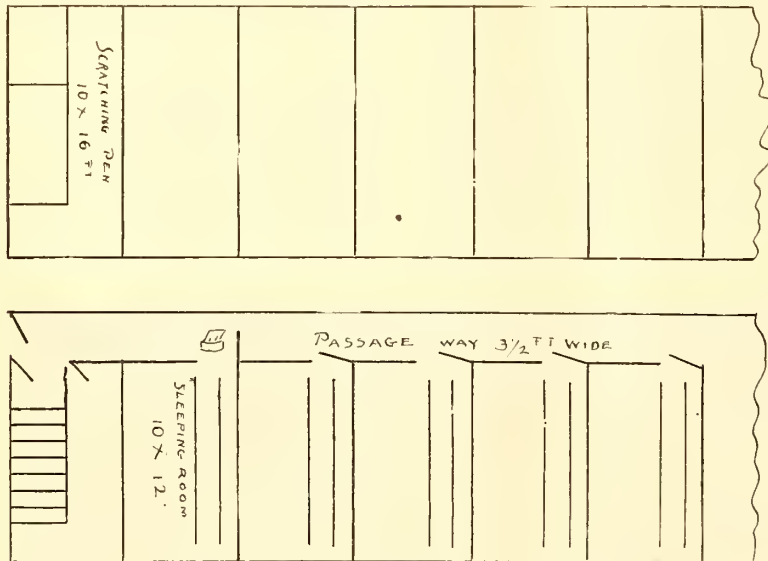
Upper and lower floor plan of Mr. Master's house.
